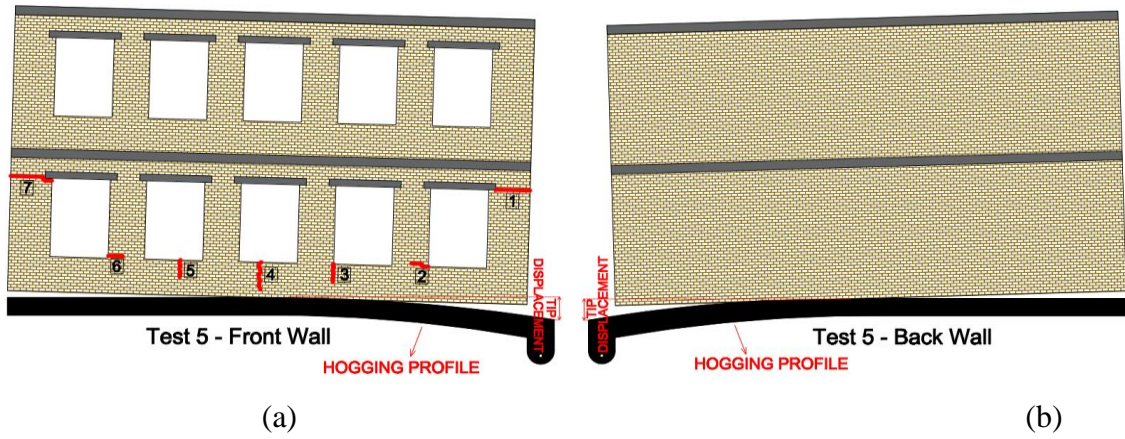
Drawings of cracks occurred at the end of Test 5: (a) on the front wall (perforated wall) of the combined specimen, (b) on the back wall (no-opening wall) of the combined specimen.
